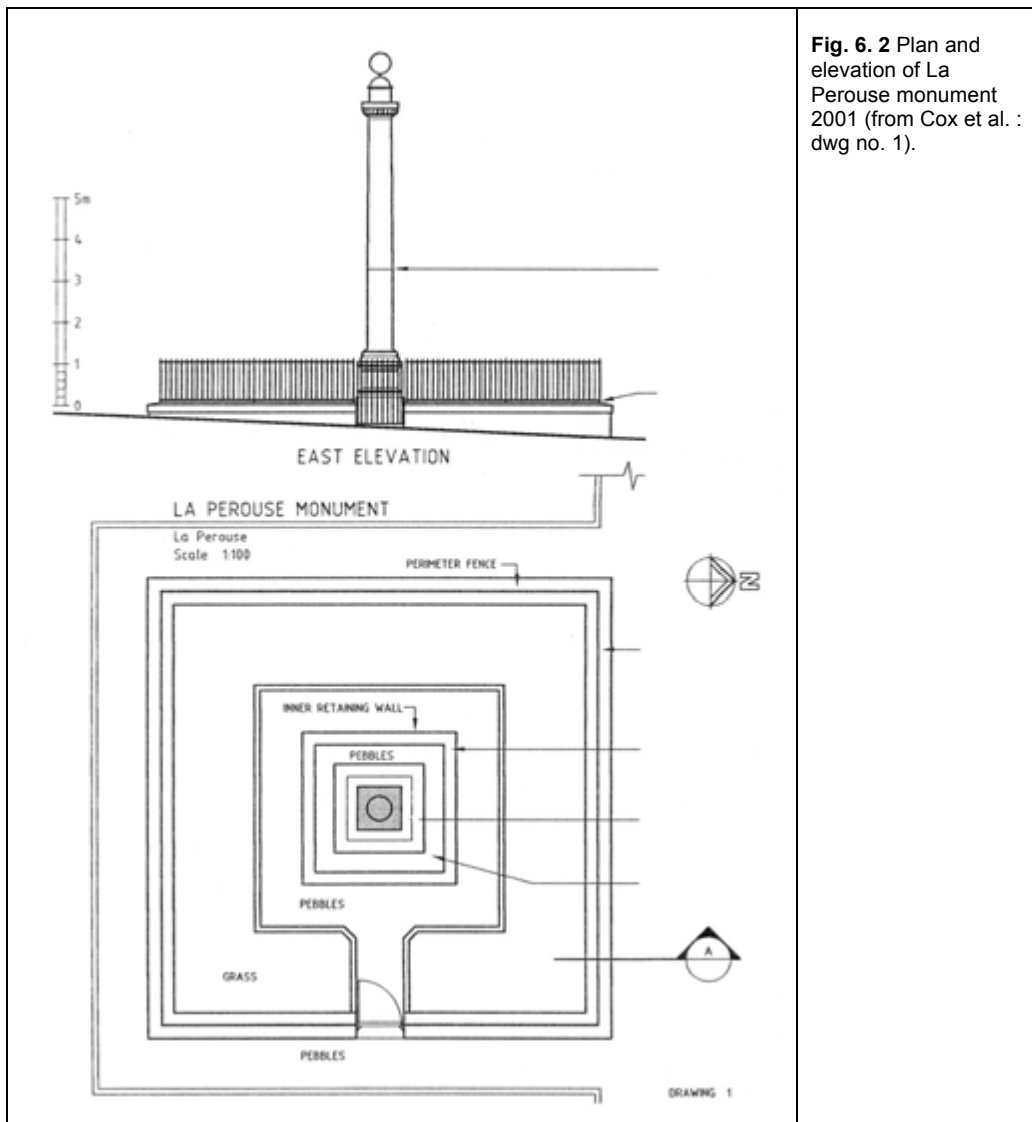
Plan and elevation of La Perouse monument 2001 (from Cox et al. : dwg no. 1).
